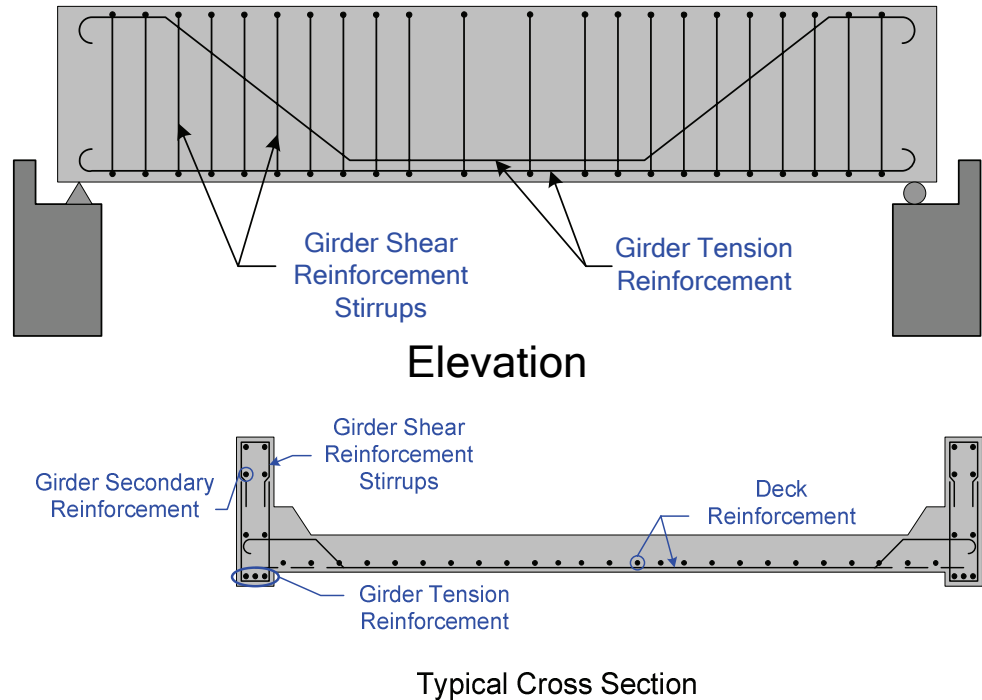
Steel Reinforcement in a Concrete Through Girder
